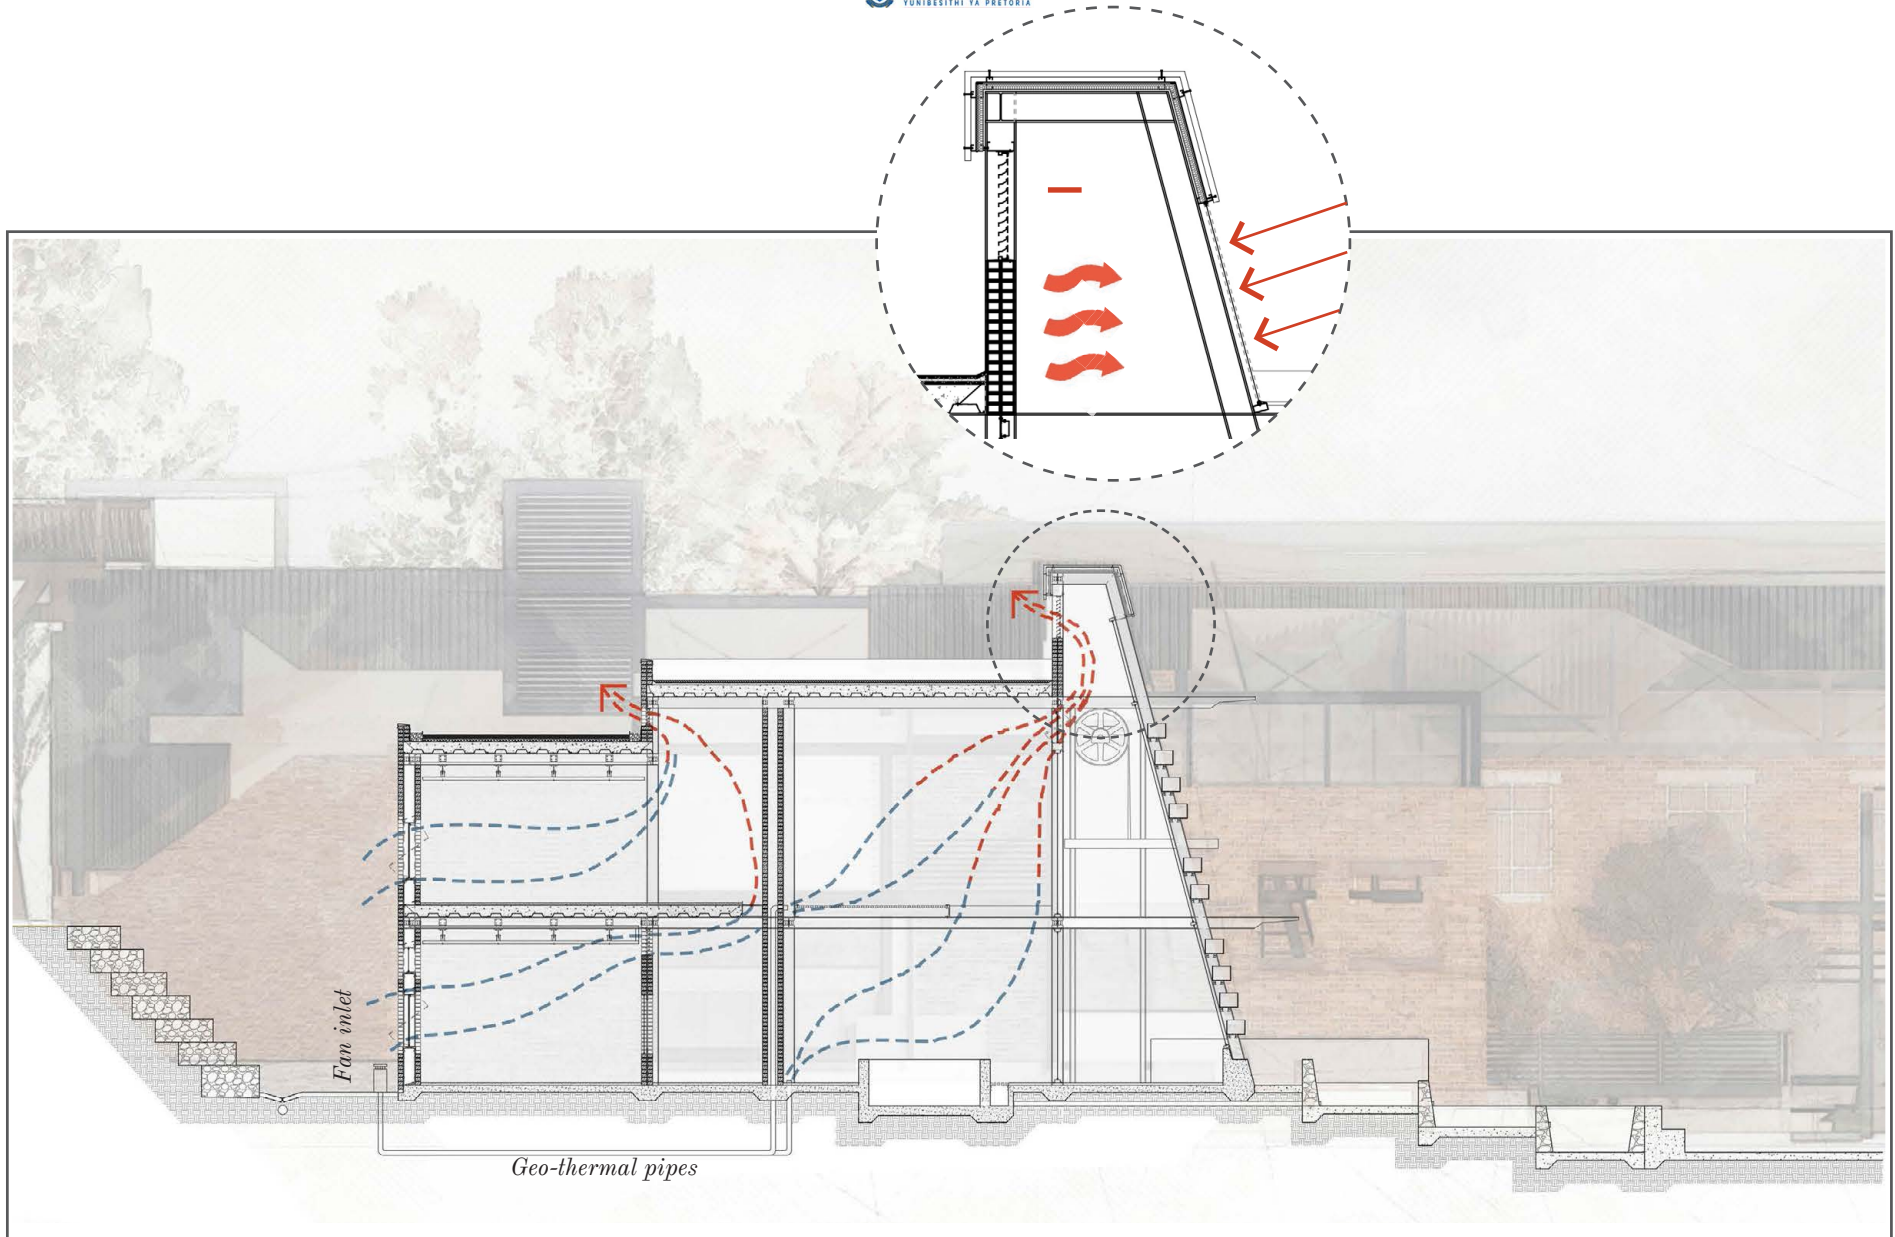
Section through proposed ventilation system in new structure (Author 2017)
